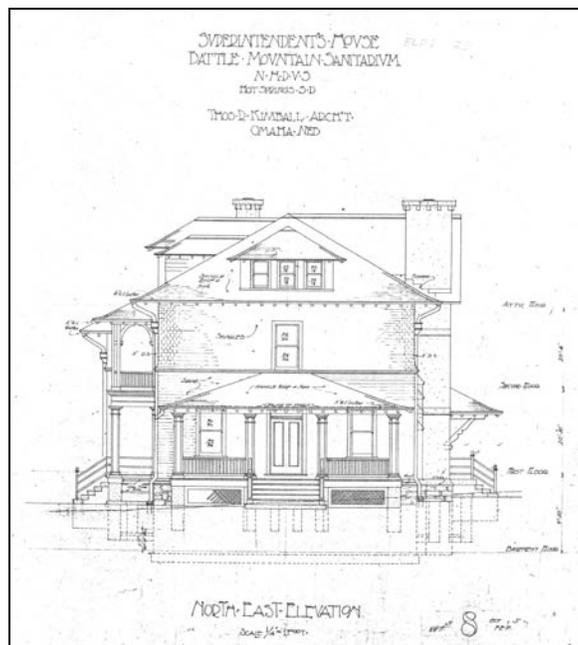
Thomas Rogers Kimball, Northeast (Side) Elevation of "Superintendent's House," (October 1905)
